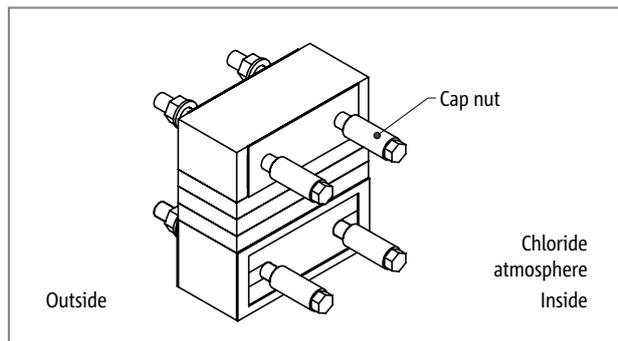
Schöck Isokorb® T type S with cap nuts: Isometry; internal atmosphere containing chloride
